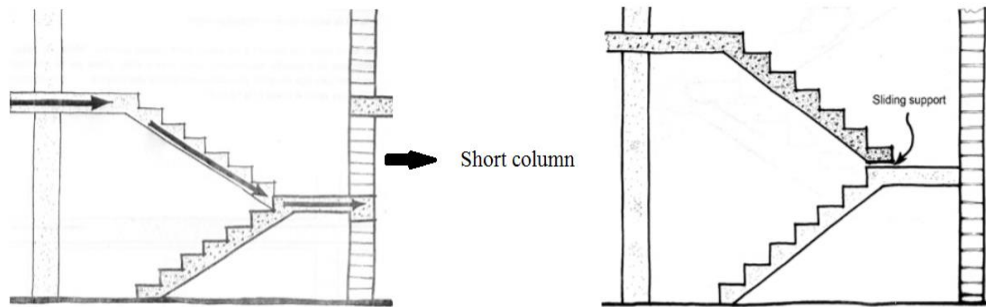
From left to right: short column created by a stair landing and on the right, sliding support in the connection between the two stringers
